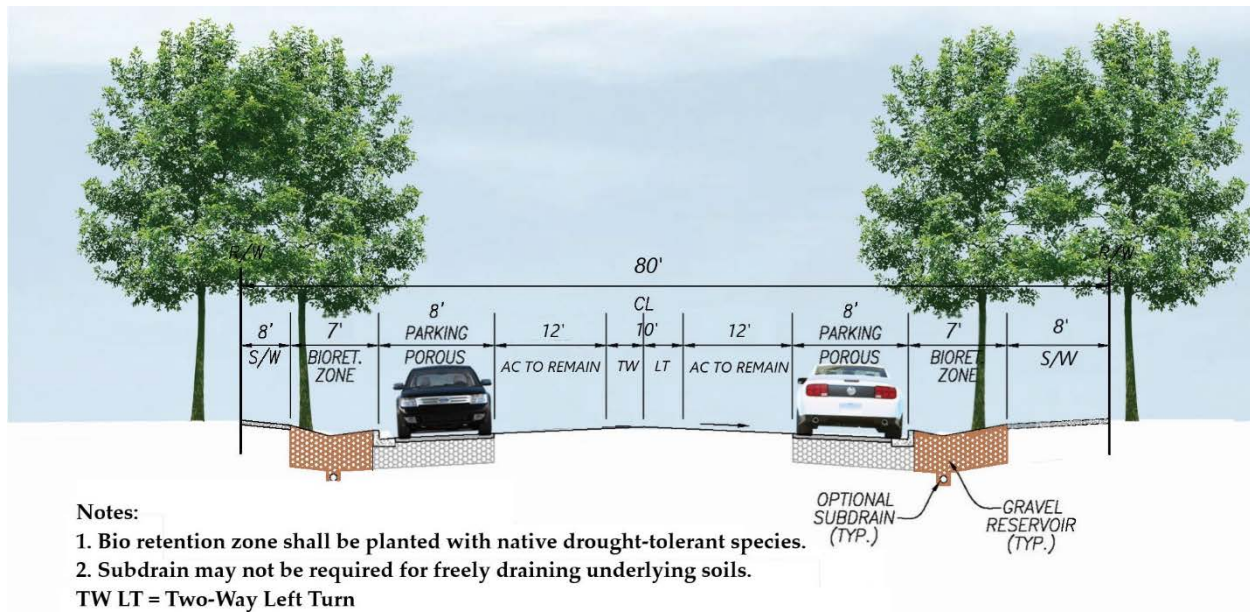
Graham Avenue Cross-Section – Main Street to Chestnut Street
